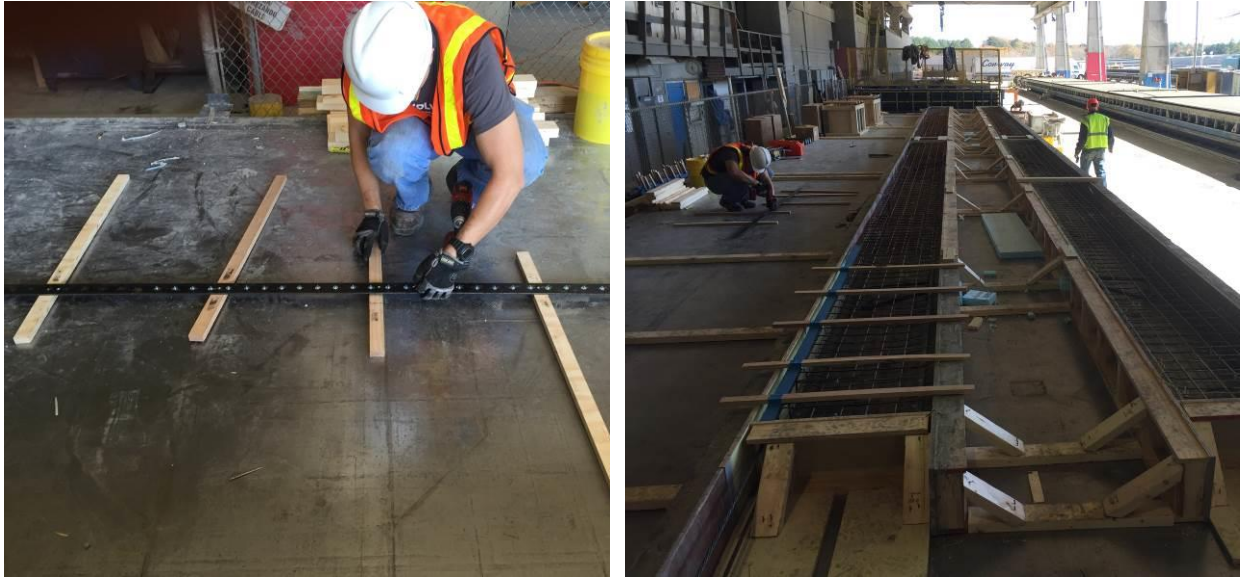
Placement of embedded nuts located in steel spacer bar for transfer length measurements.
